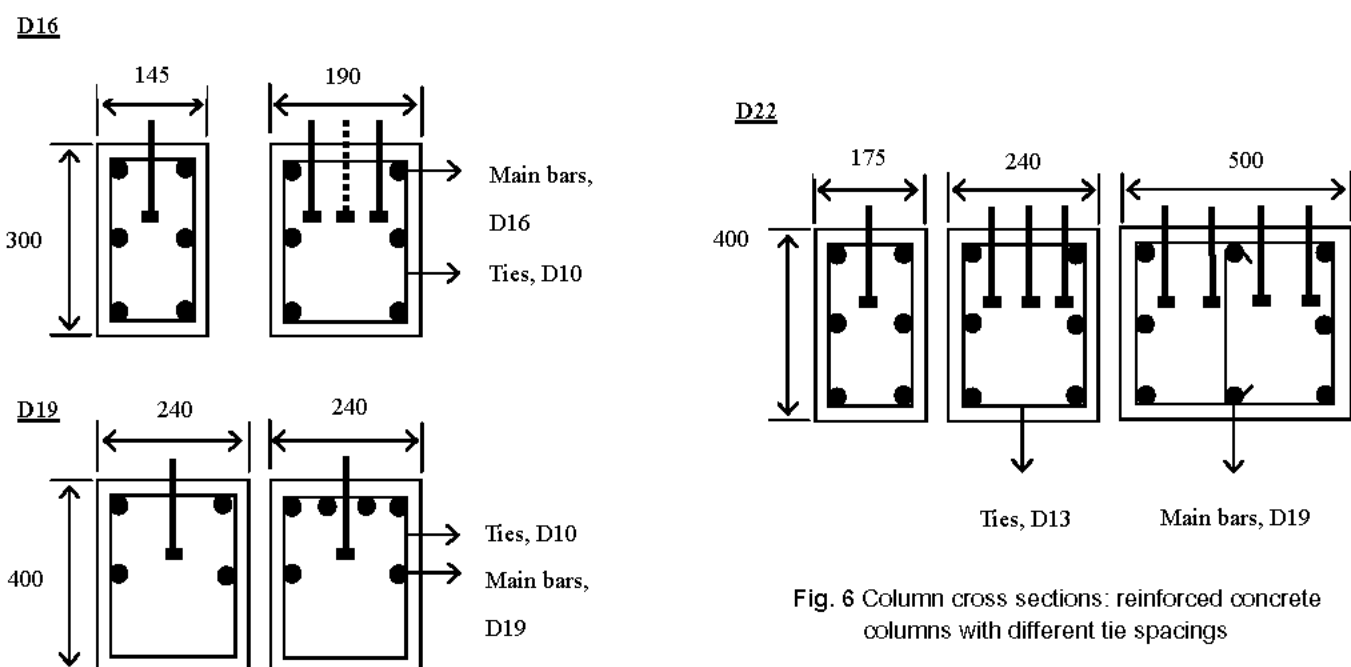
Column cross sections: reinforced concrete columns with different tie spacings
